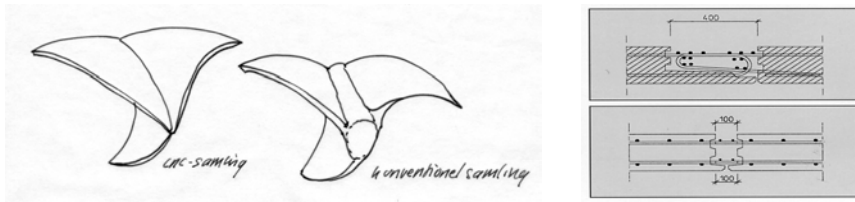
The joints can be slender and neat with CRC. CRC-jointcast is an example of a joint based on CRC-technology. The width of this joint is smaller than conventional and the reinforcement is straight contrary to the conventional where it is curved, which makes it more simple to manufacture.
